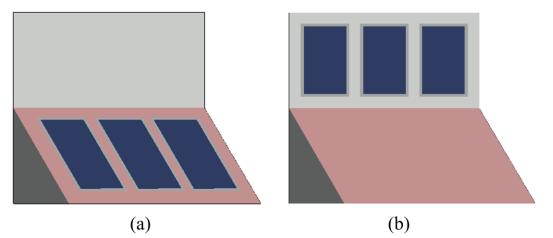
Position of PV panels on (a) window canopies and (b) building envelope.
